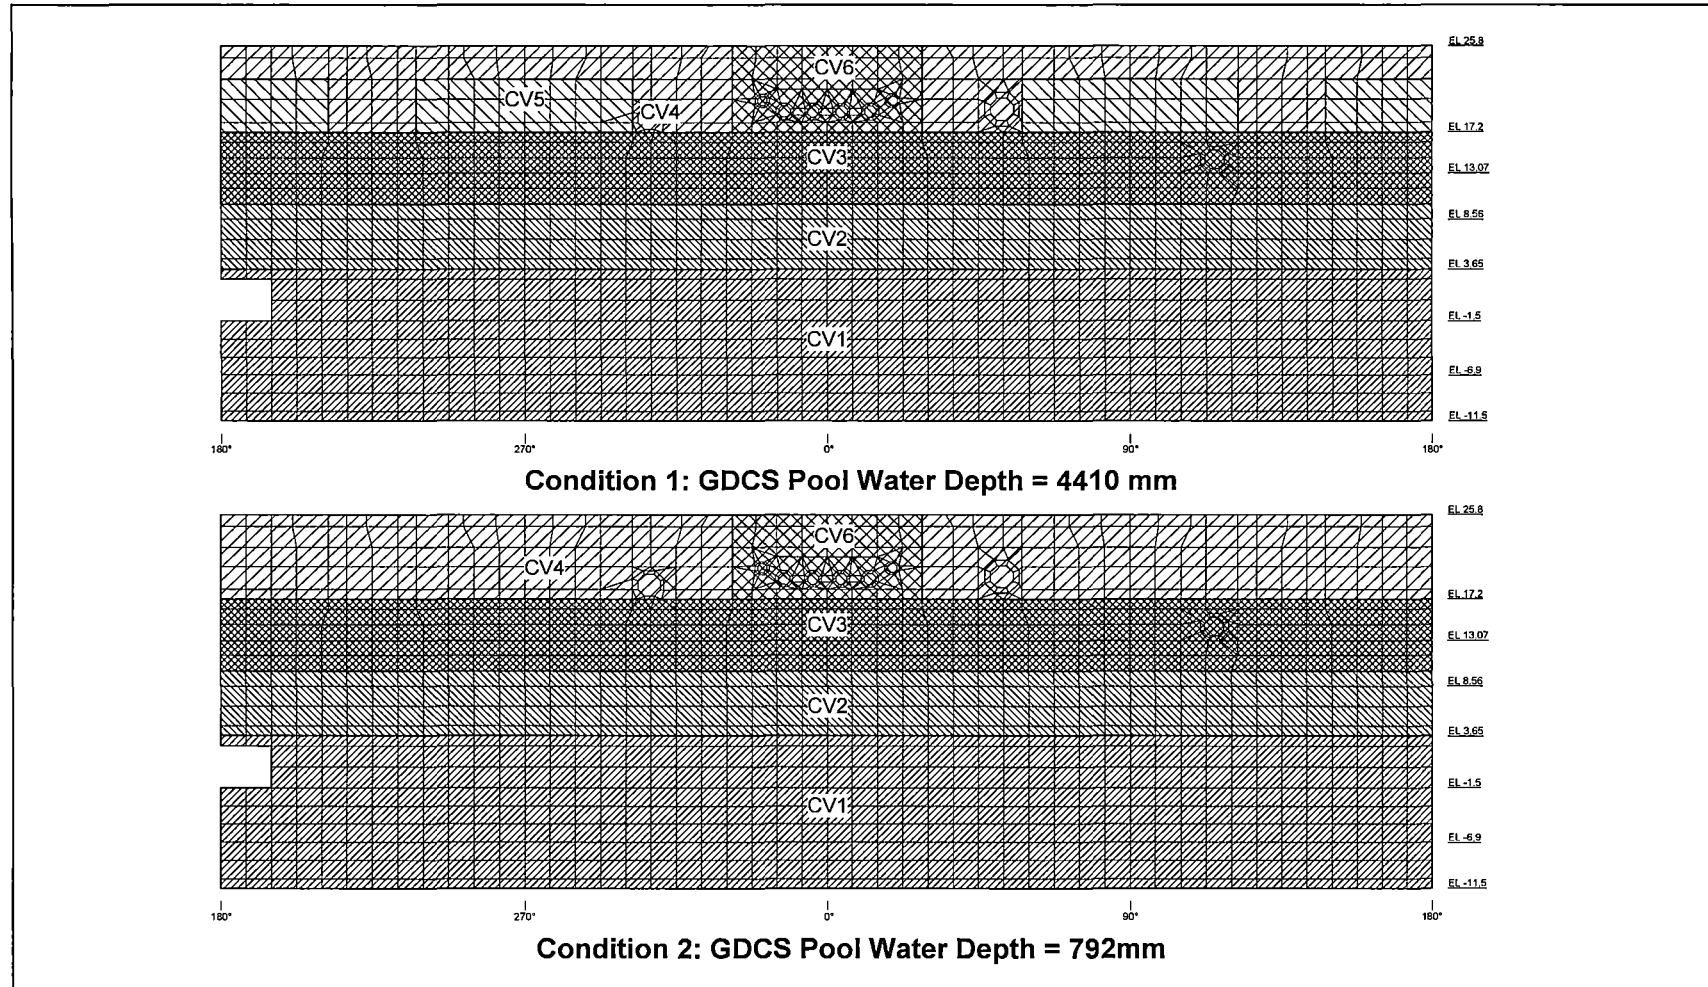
Application of Thermal Load on the RCCV Wall (DBA)
